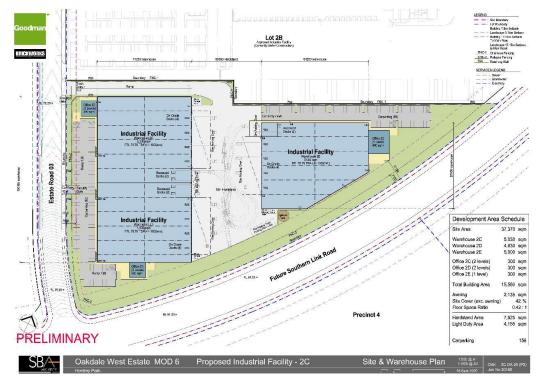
Proposed layout Warehouses 2C - 2E (Source: Goodman)
